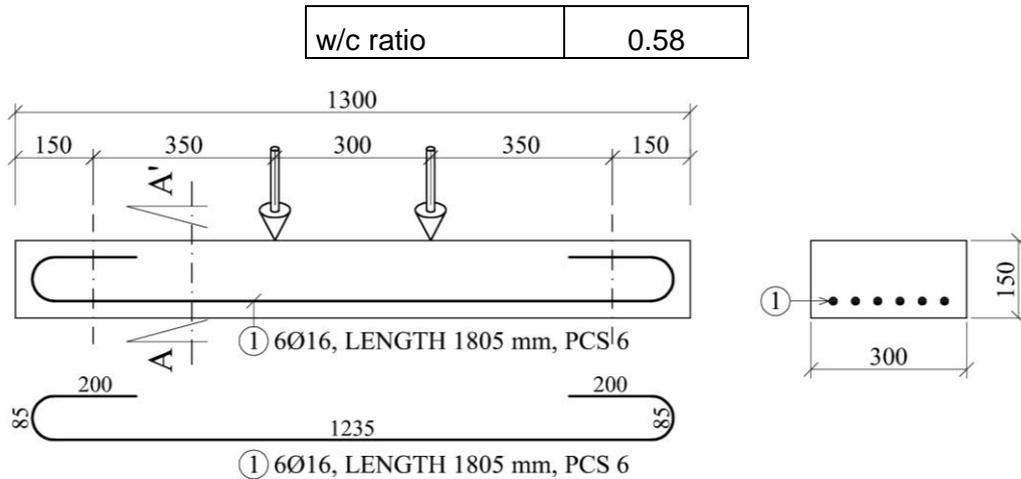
Scheme of the fatigue testing specimen and its reinforcement
